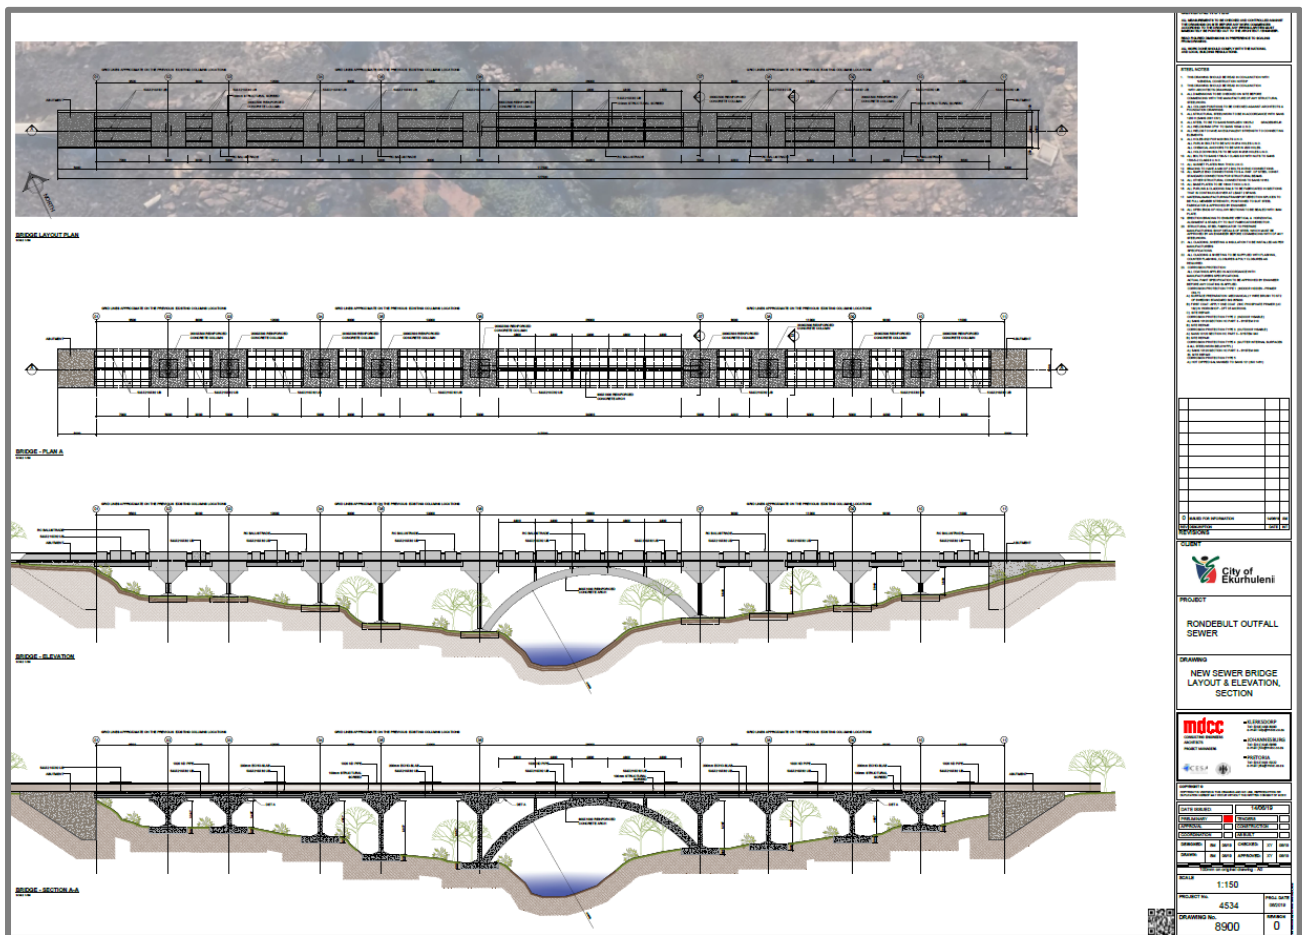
Illustration of proposed engineering design 1 (MDCC Consulting Engineers)
